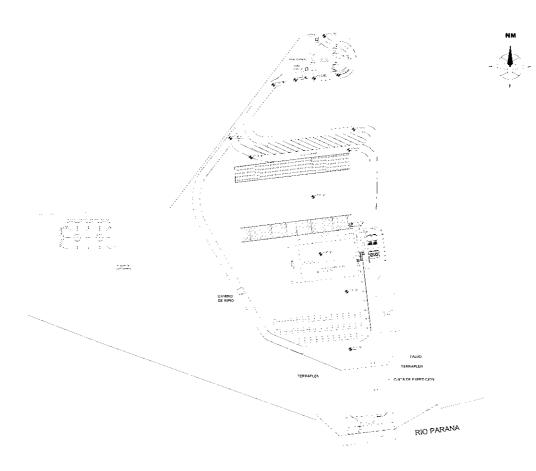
Schematic Drawing of Arrangement of Facilities
